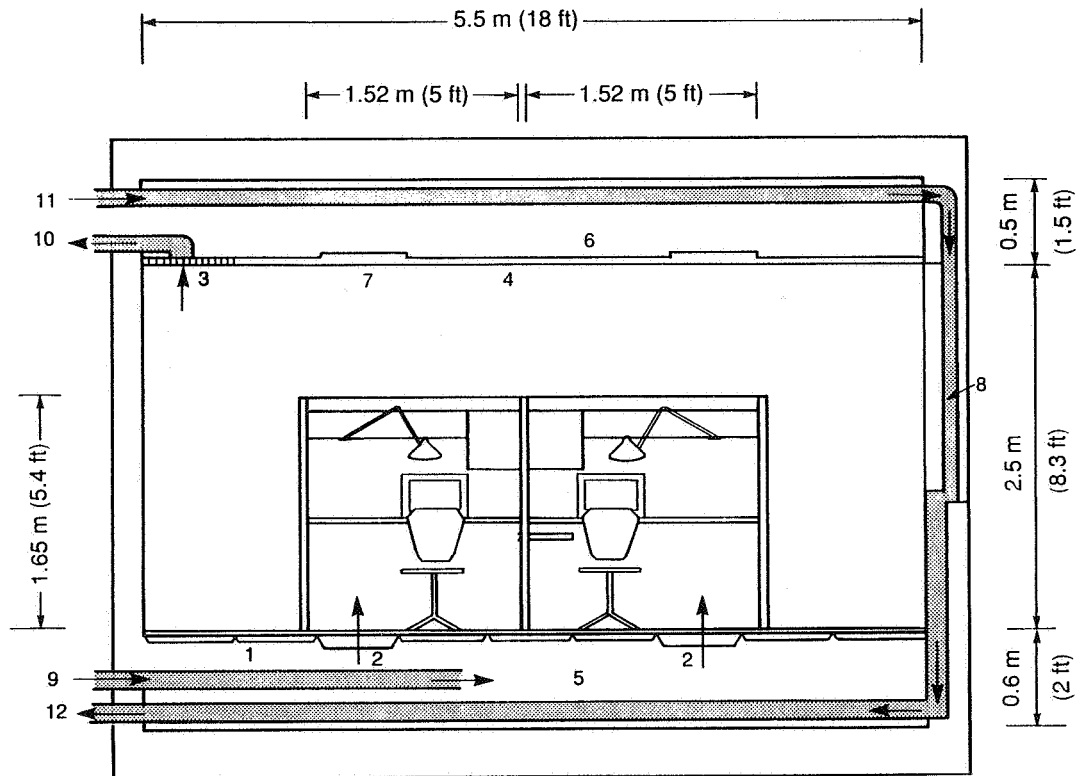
Cross section of CEC. Numbered items are: 1 = floor panel; 2 = TAM; 3 = return grill; 4 = suspended ceiling; 5 = subfloor plenum; 6 = ceiling plenum; 7 = light fixture; 8 = annular space between windows; 9 = air supply to subfloor plenum; 10 = air return to HVAC system; 11 = conditioned air supply to annular space; 12 = air return from annular space to HVAC system. The return-air grill is centered between the front and back walls.
